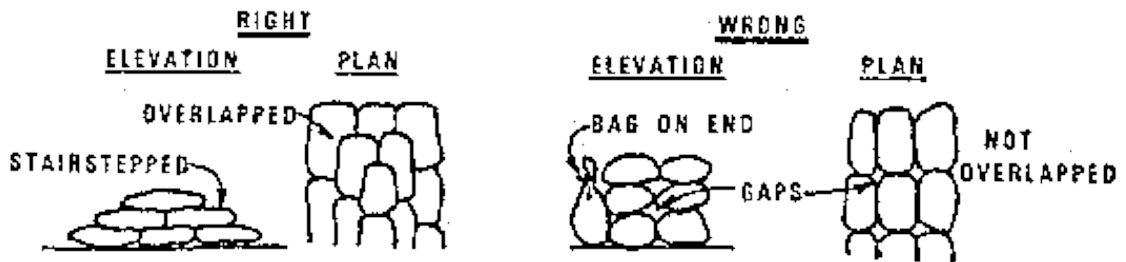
Proper Assembly of a Sandbag Barrier [42]
